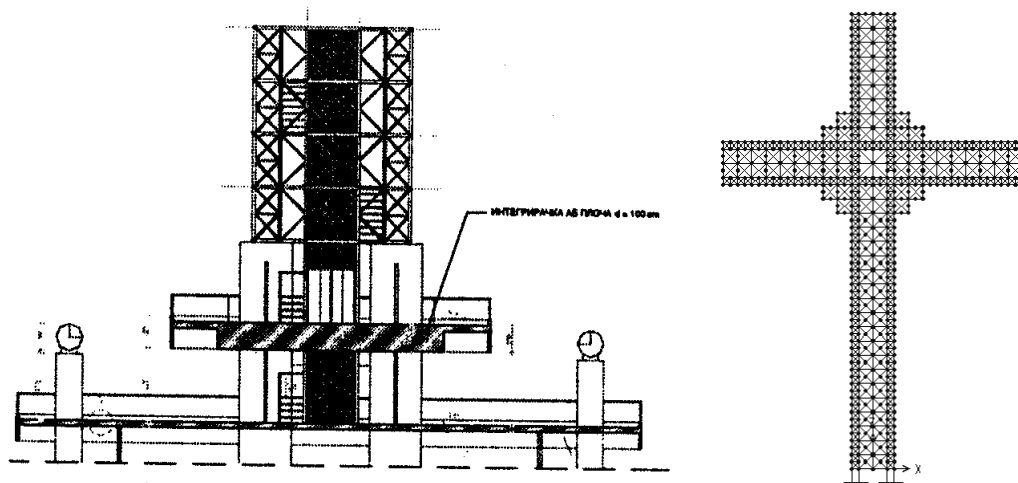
Vertical cross-section of the three-story RC pedestal (a) and steel structure (b) of the Cross
